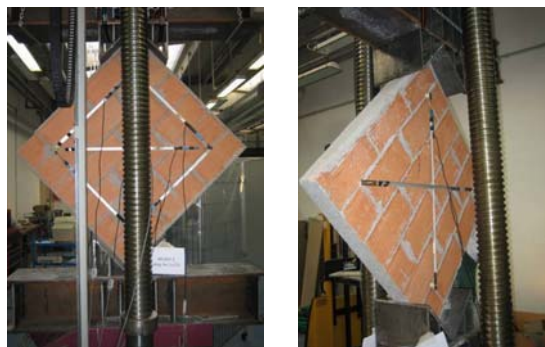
equipment for diagonal on hollow brick walls (front and back view of the panel)
